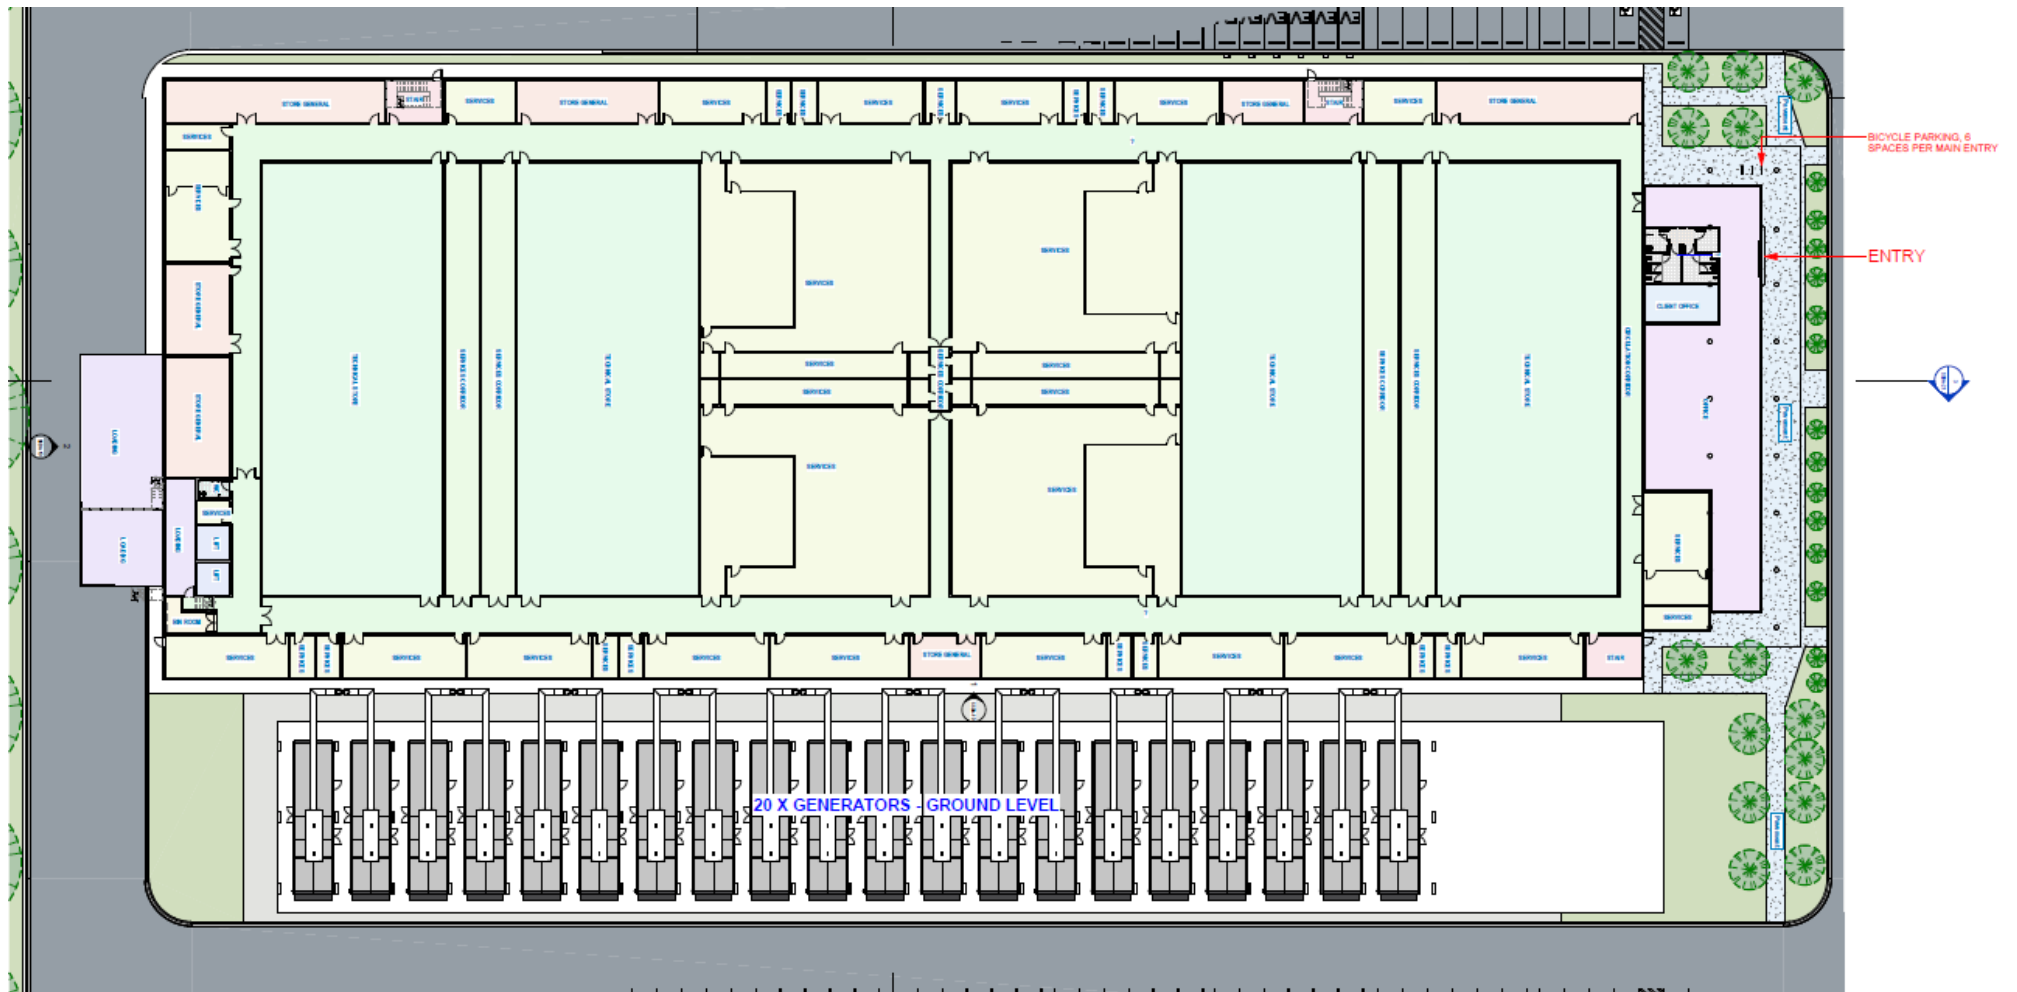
Typical 84MW Data Centre - Ground Floor Plan
